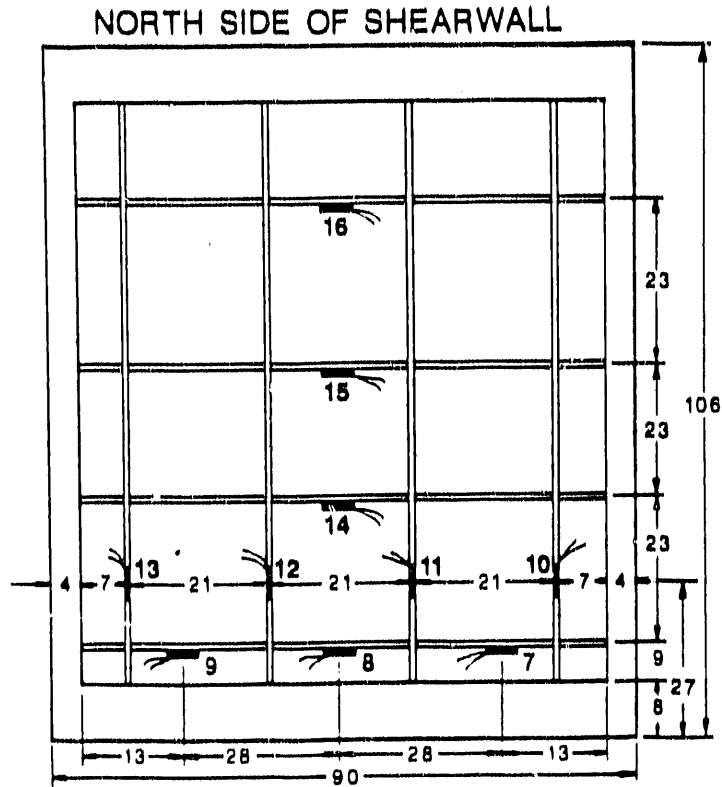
North side layer of reinforcement in the shear wall and strain gage locations. (All dimensions are in inches).
